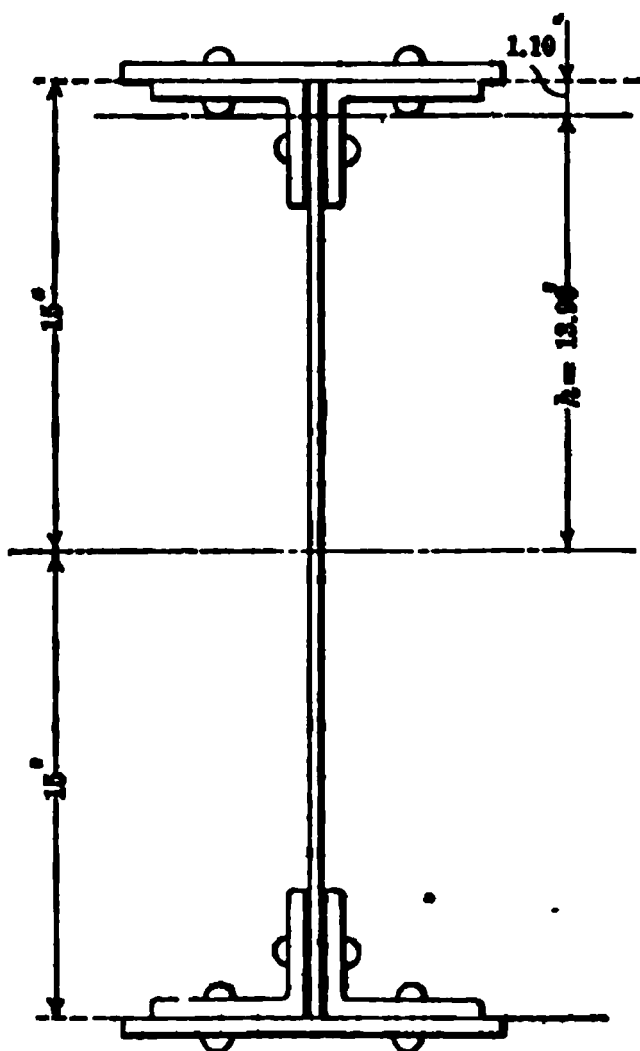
Moment of Inertia of Cross-section of Plate Girder with Flange-plates
